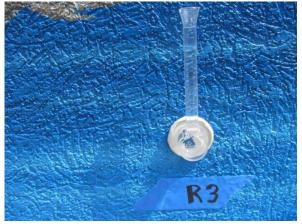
Water filled to 5ml mark. No water was absorbed into tested area.
